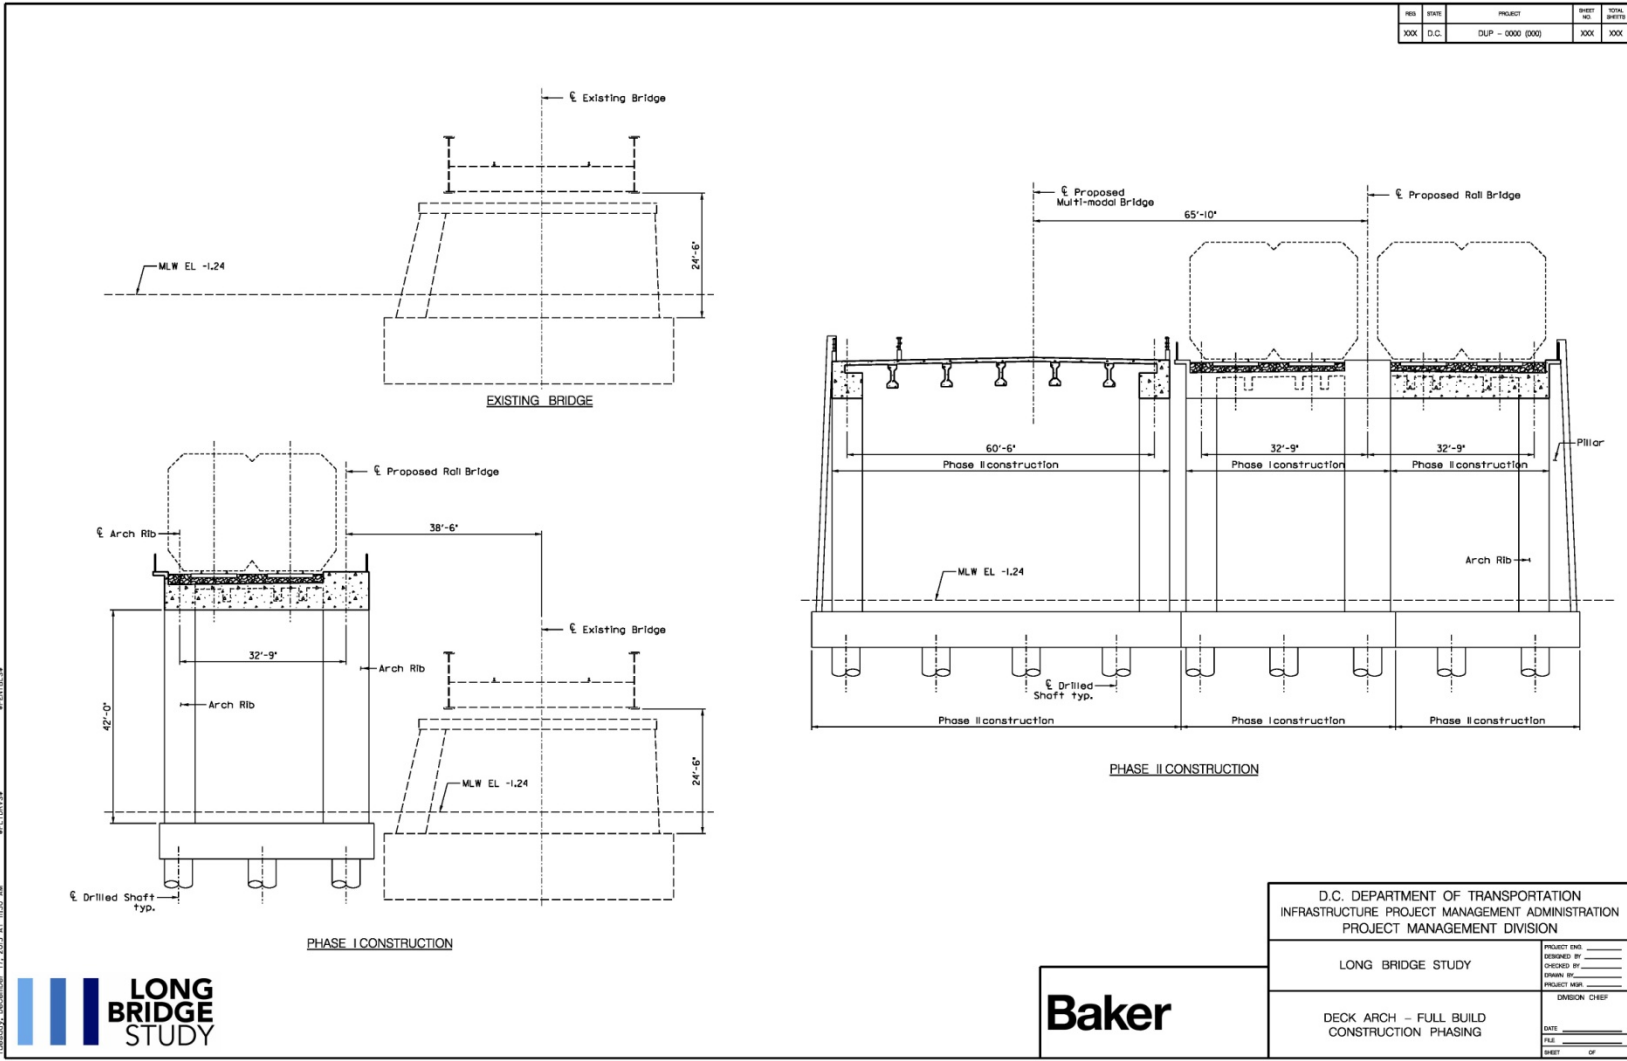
Concrete Deck Arch Construction Phasing – Full Build
